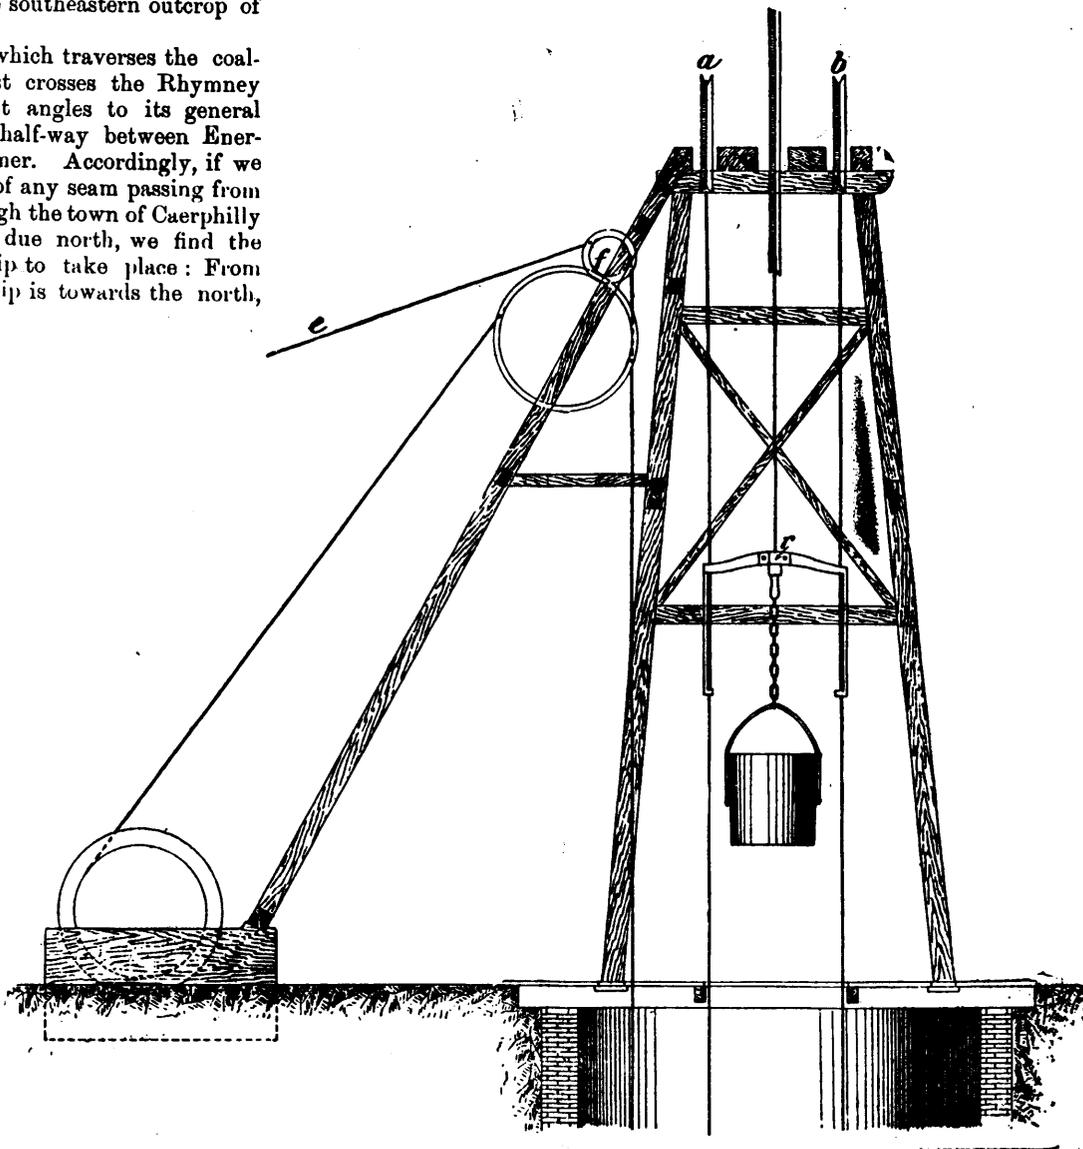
Guides. Elevation. Scale,  $\frac{1}{4}$  in. = 1 ft.
